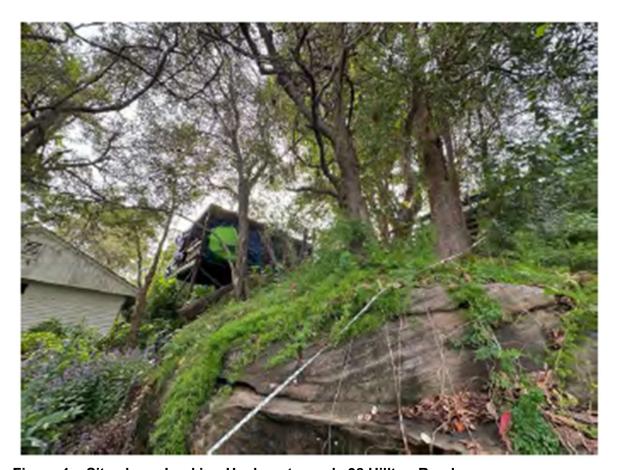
Site slope: Looking Upslope towards 98 Hilltop Road:
